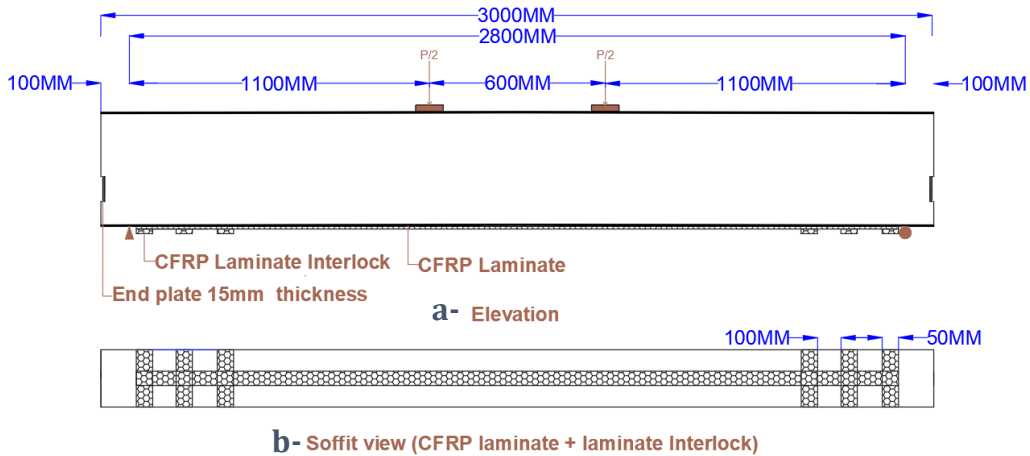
Laminate with interlock anchorage, a- elevation b- soffit view
